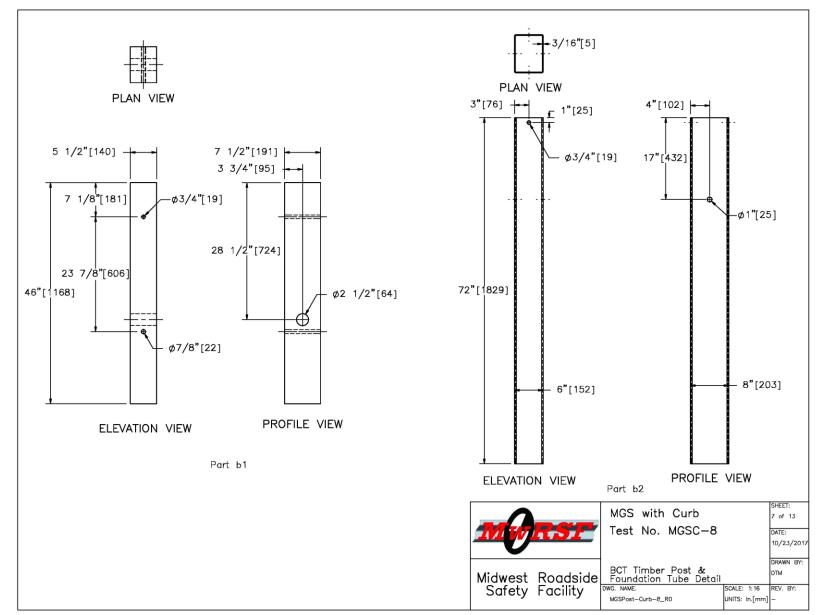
BCT Timber Post and Foundation Tube Detail, Test No. MGSC-8
